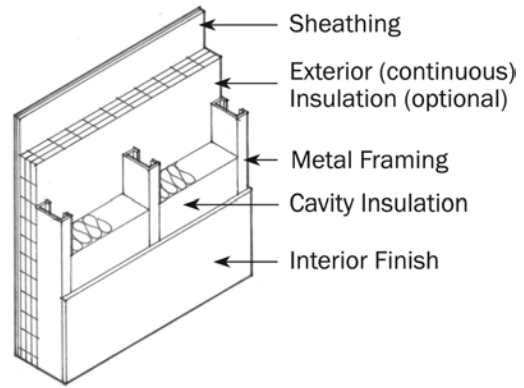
(EN8) Walls, steel framed—a common construction type in nonresidential buildings.
